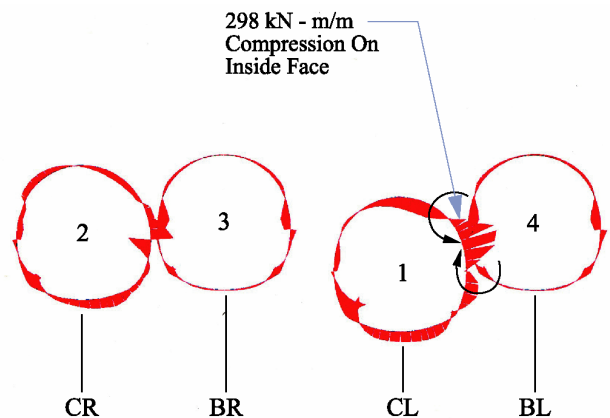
Calculated Bending Moments in Tunnel Linings for Condition of All Tunnels Excavated, Start of Tunneling, Sta 219+10
